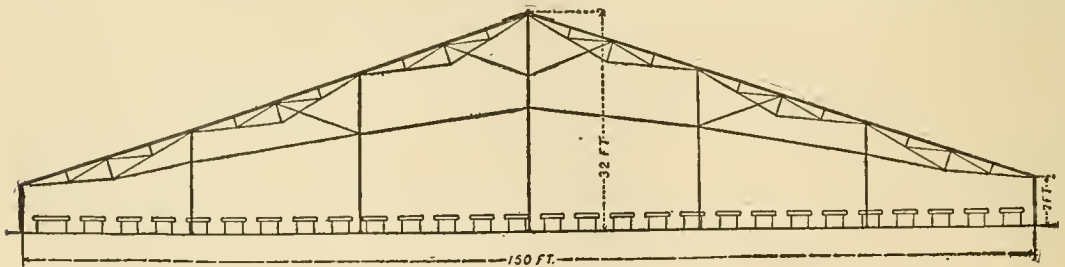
Modern greenhouse construction. Design of even-span house, 150 feet wide. (Kiug Construction Company.)
